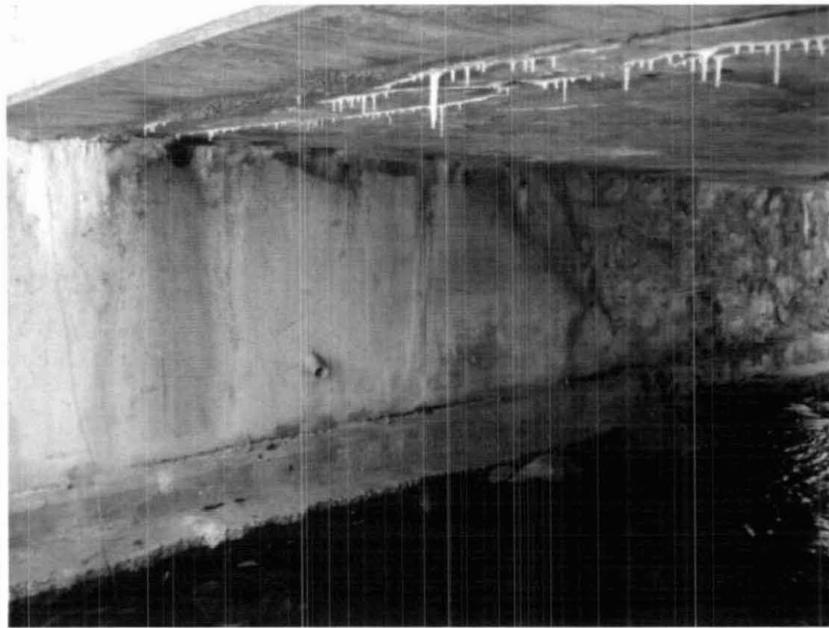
ABUTMENT # 2 WITH SAND BAGS AT FACE OF SCOUR WALL SCOURED AWAY. NO UNDERMINING AT THIS INSPECTION.
